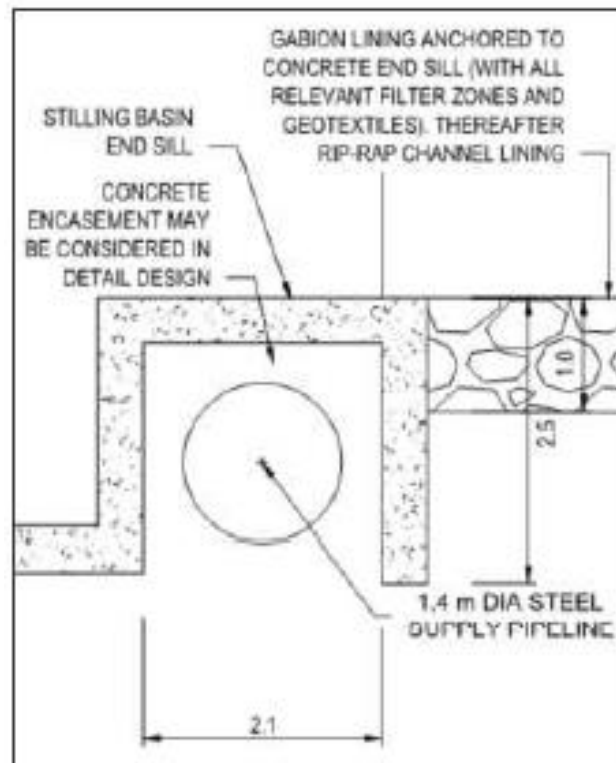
Typical detail of pipe underneath spillway (DWS, 2020)
